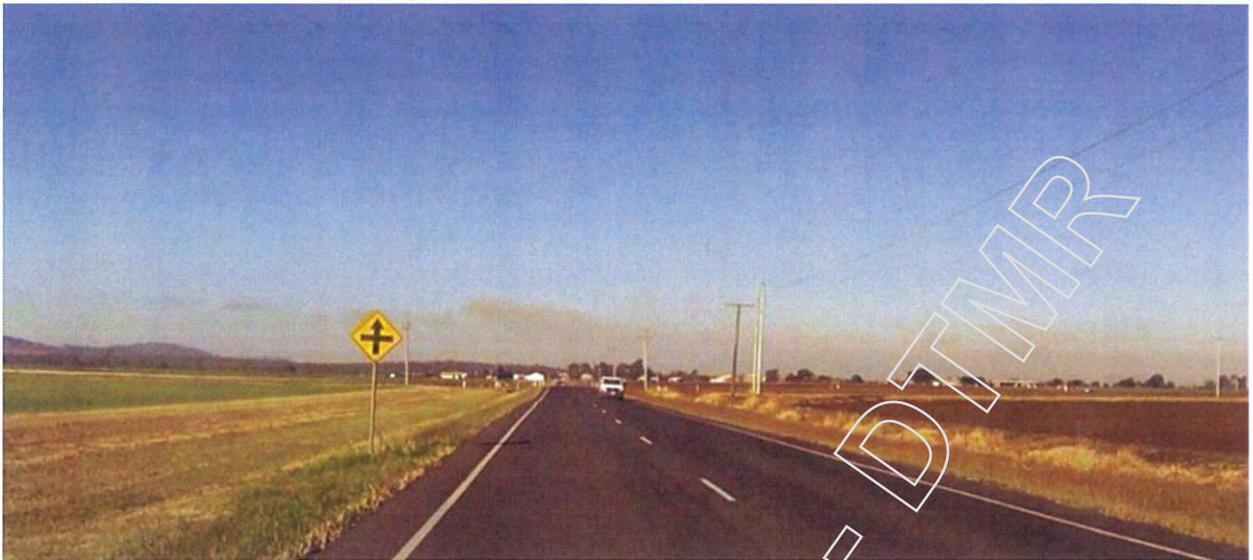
Forest Hill Fernvale Road – Southbound Approach - Intersection Warning Sign
